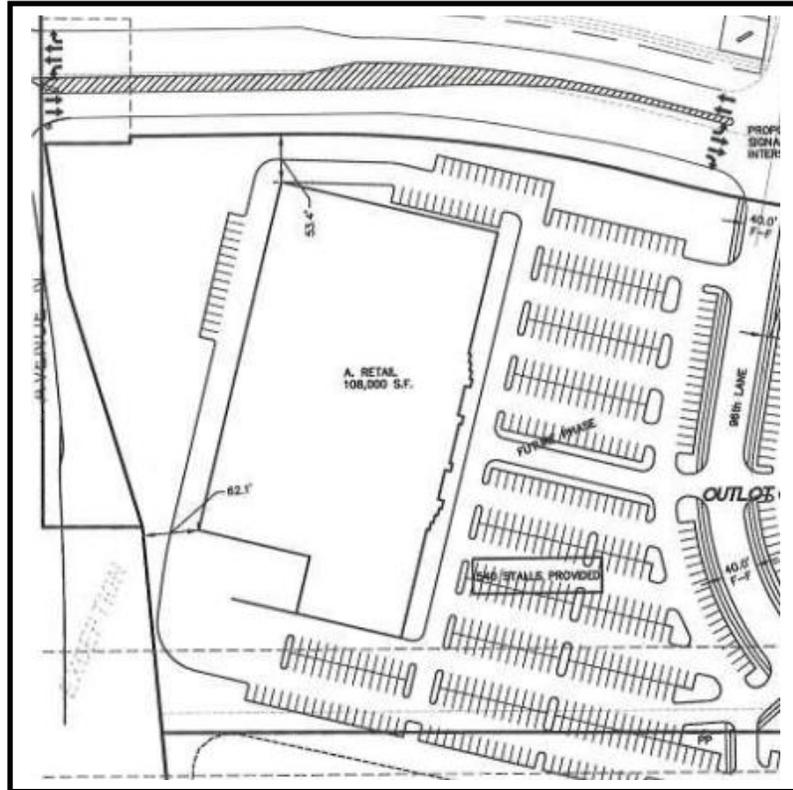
Former Site Plan of 610 West Development Area (Source: Westwood Professional Services, May 2005)
